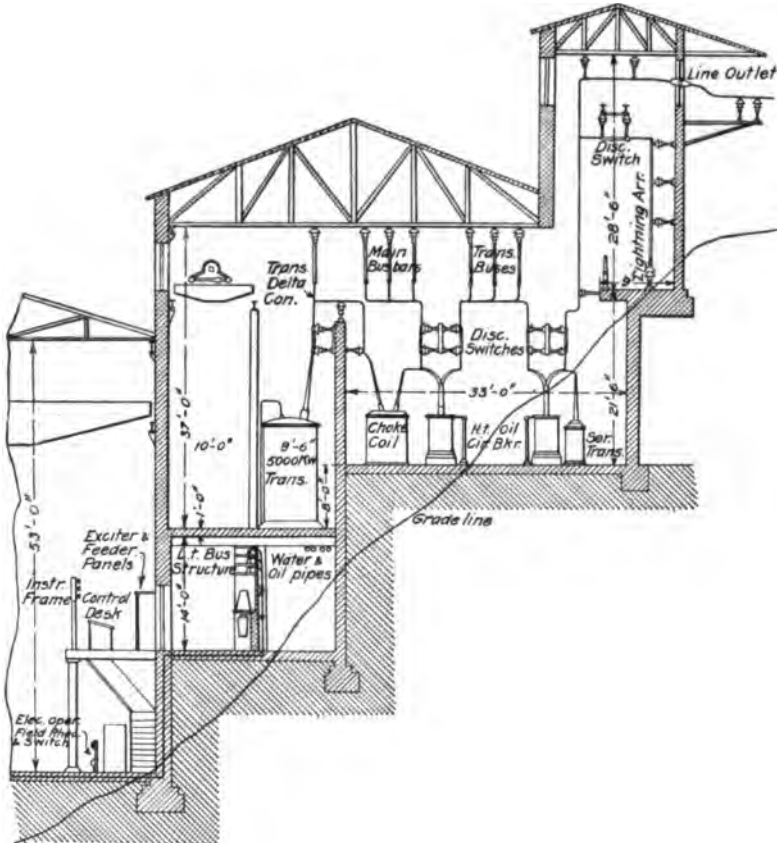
60,000-Volt Station ; Section through Switching House.
